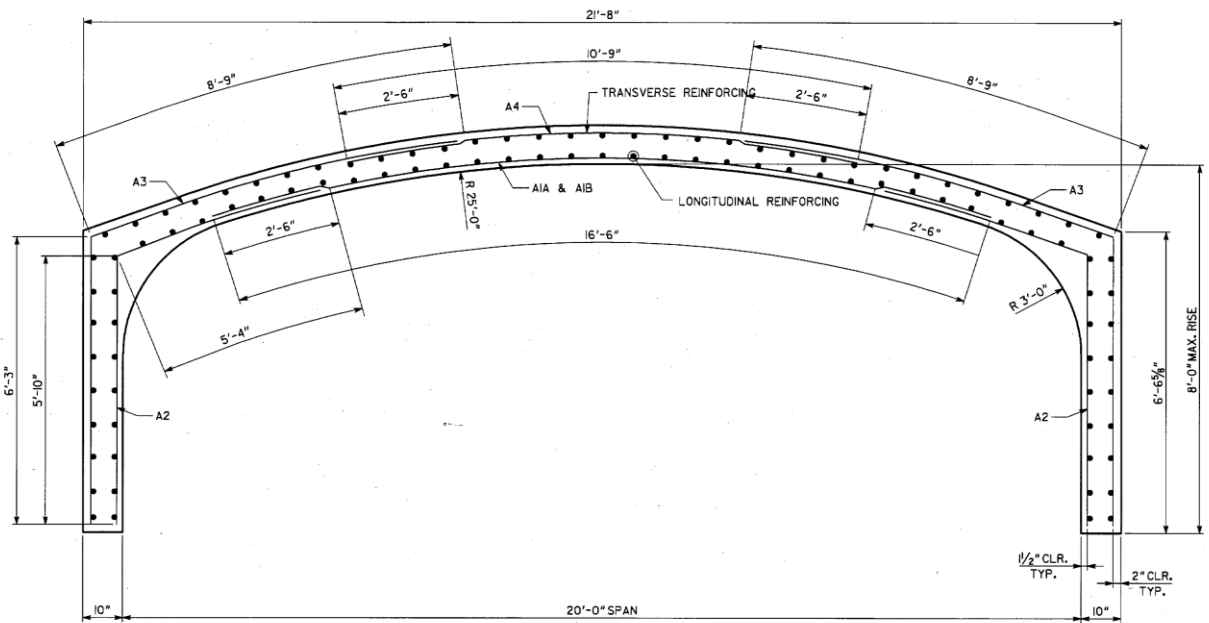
Laboratory Test Specimen – 20 ft Clear Span Section
